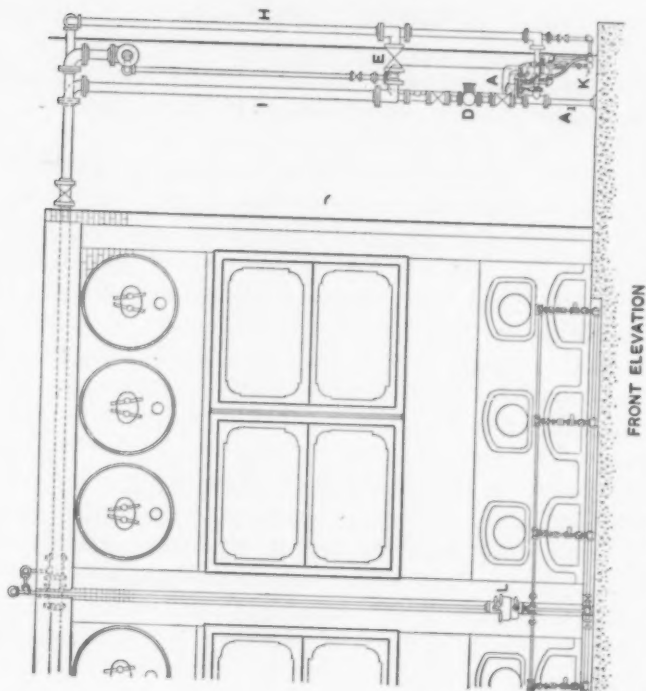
GENERAL ARRANGEMENT OF APPARATUS—FRONT ELEVATION AND LIST OF PARTS
